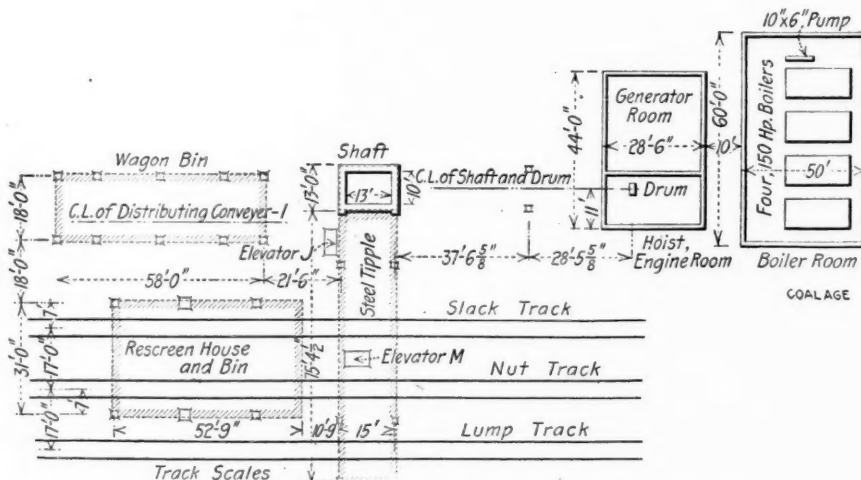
PLAN SHOWING SURFACE ARRANGEMENT OF PLANT
